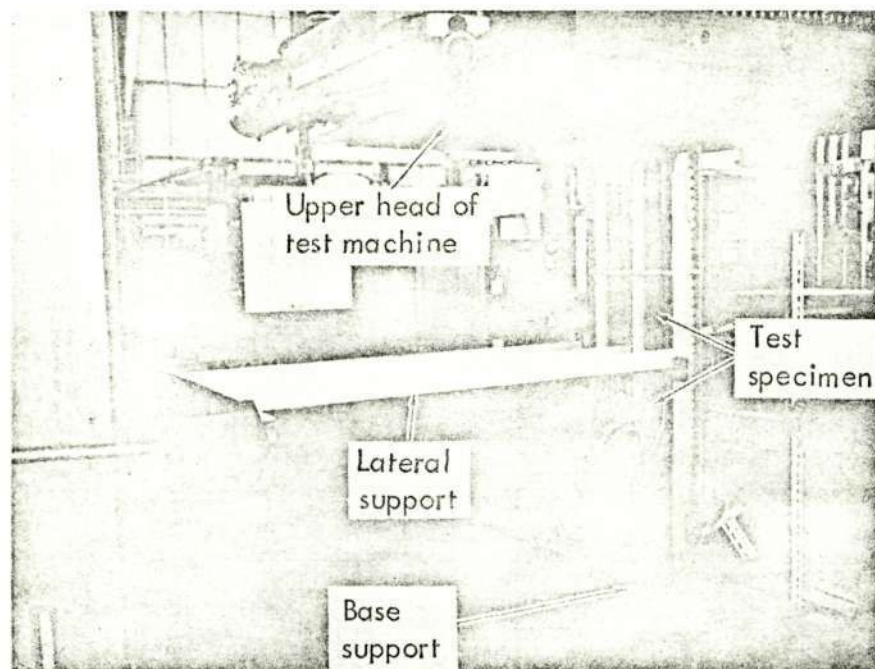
130-JE-2 SPECIMEN INSTALLED IN TEST MACHINE
